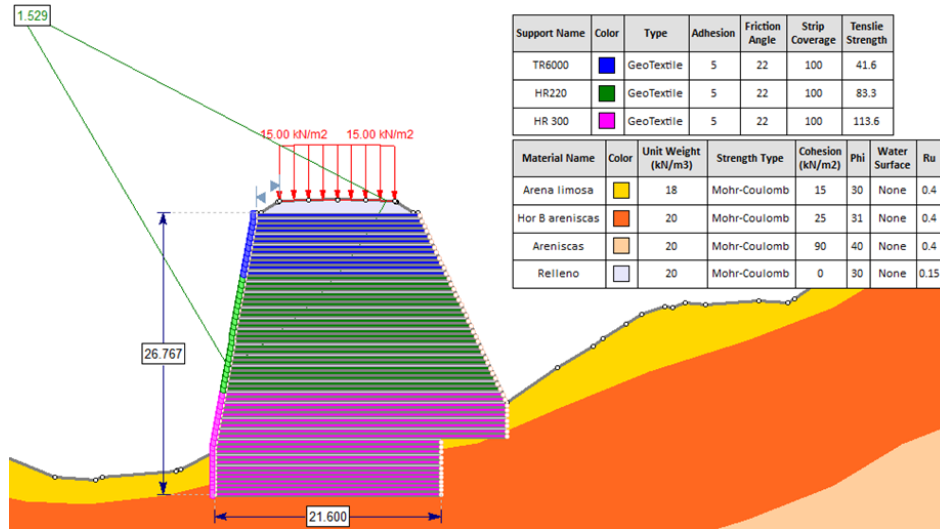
Global stability evaluation of the Critical Section of the Reinforced Soil Wall
